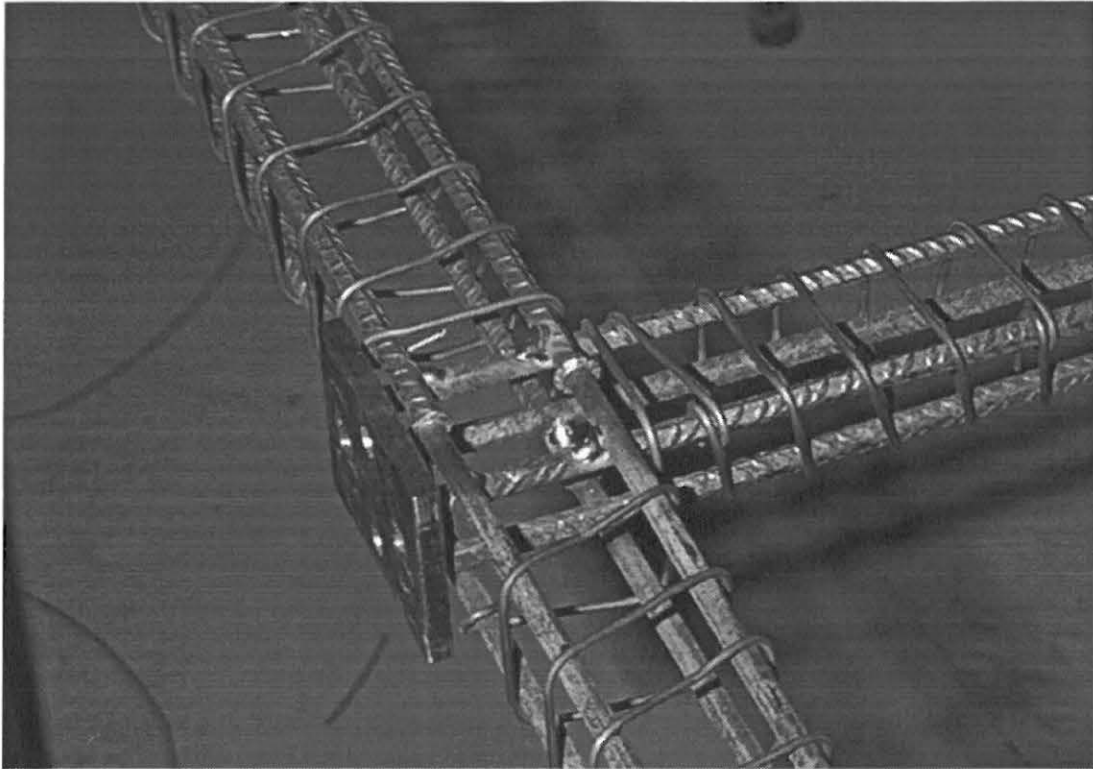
Detail showing stuk-welding of reinforcement.
